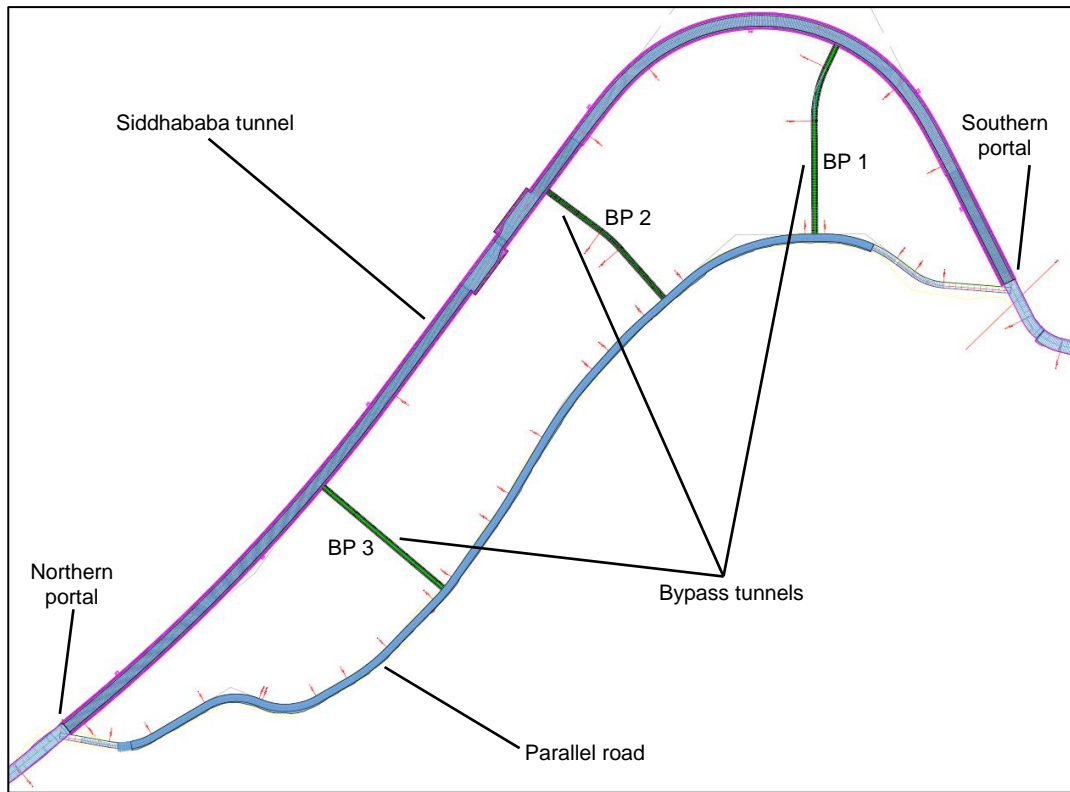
Overview Siddhababa tunnel with the bypass tunnels (towards the parallel road)
